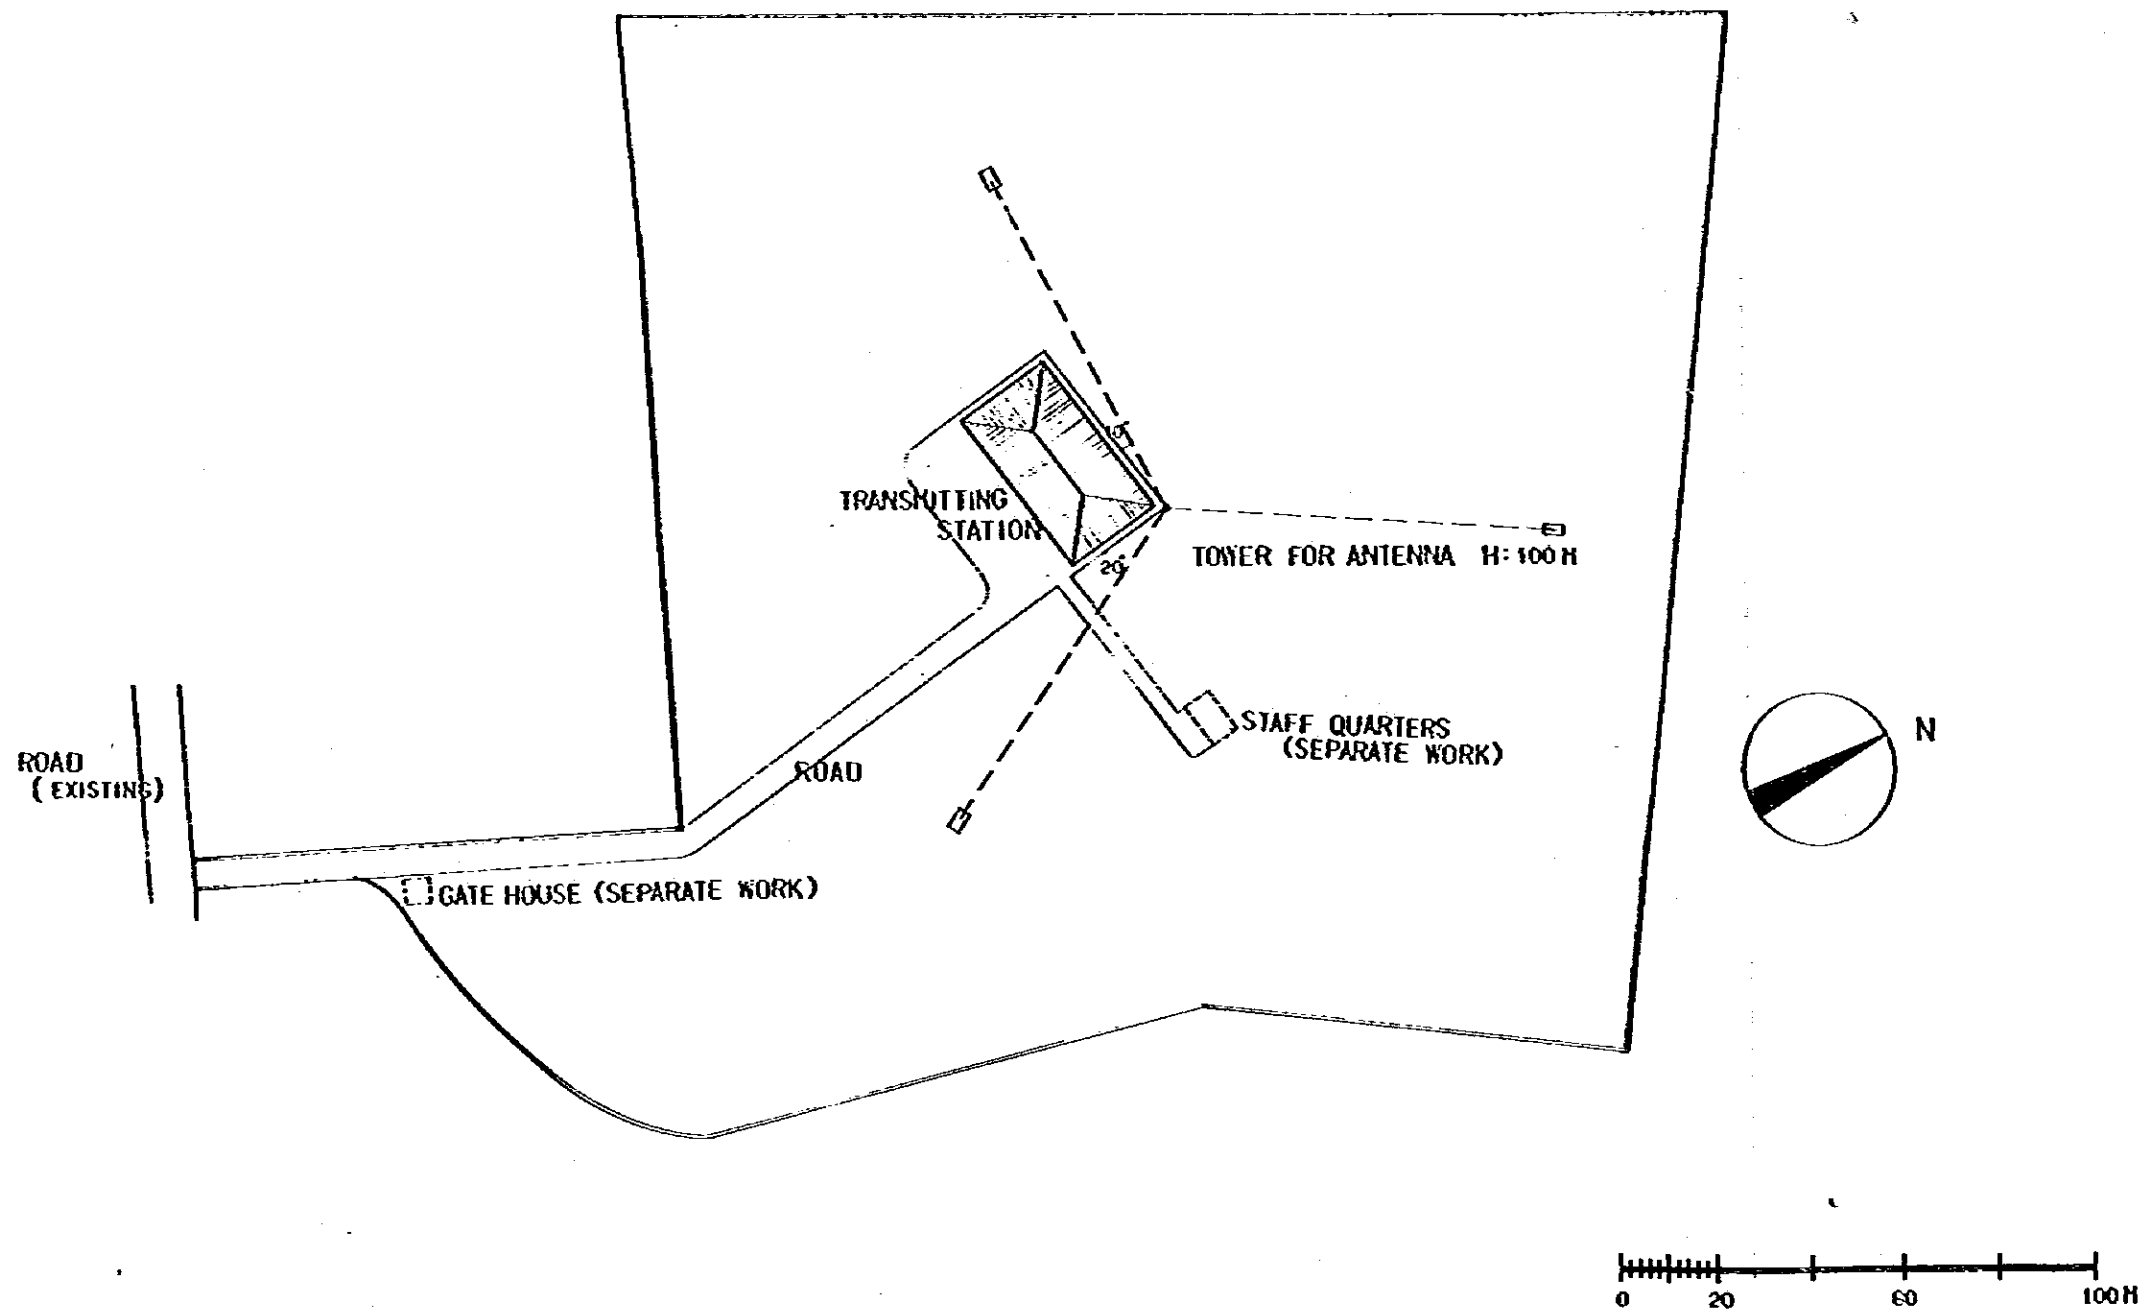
SITE PLAN — POKHARA TRANSMITTING STATION
